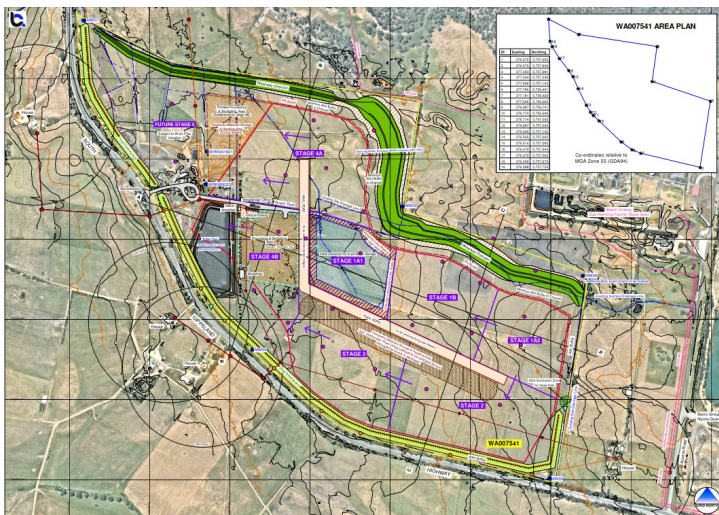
Site Layout Plan (Source: BCA Consulting, 2023)
